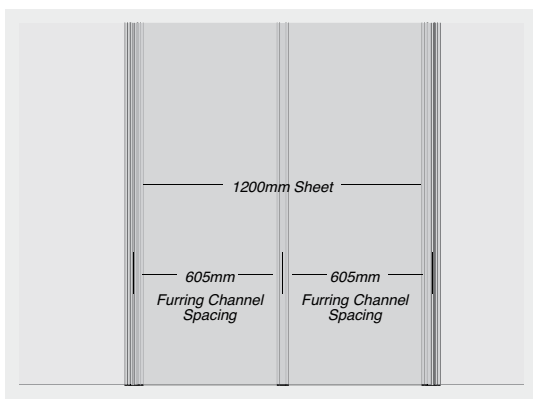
Horizontal Sheeting Half-bond Pattern
